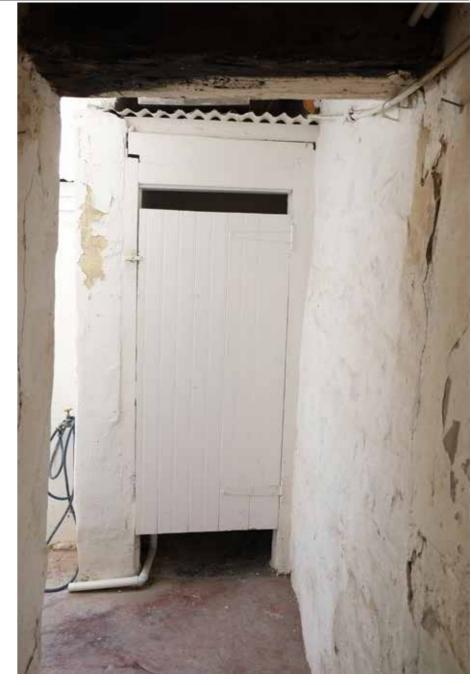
Beneath the stairs and passageway looking to rear ground floor outbuilding (W/C) south
